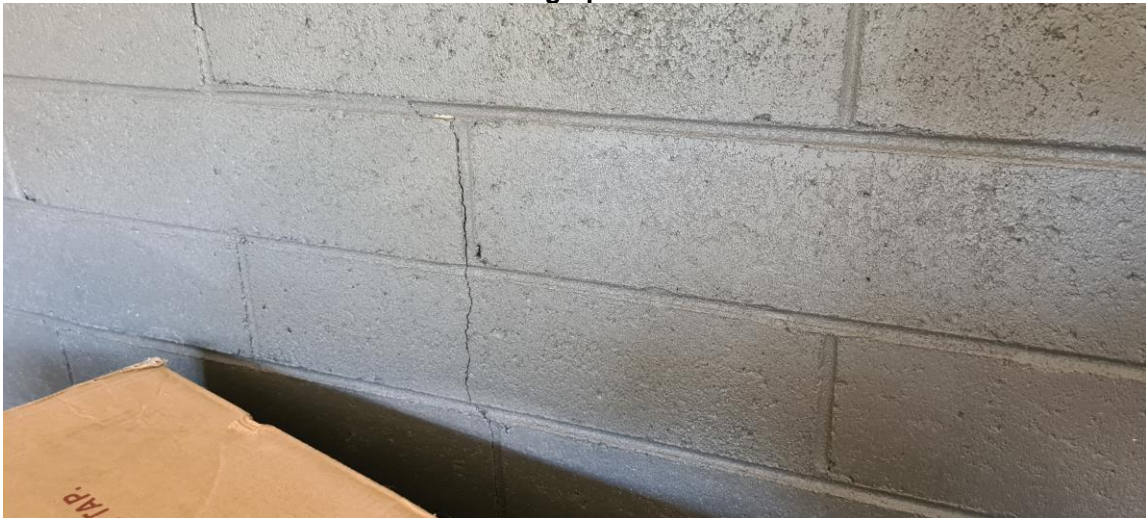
Stepped crack in brick wall between carport and storeroom
